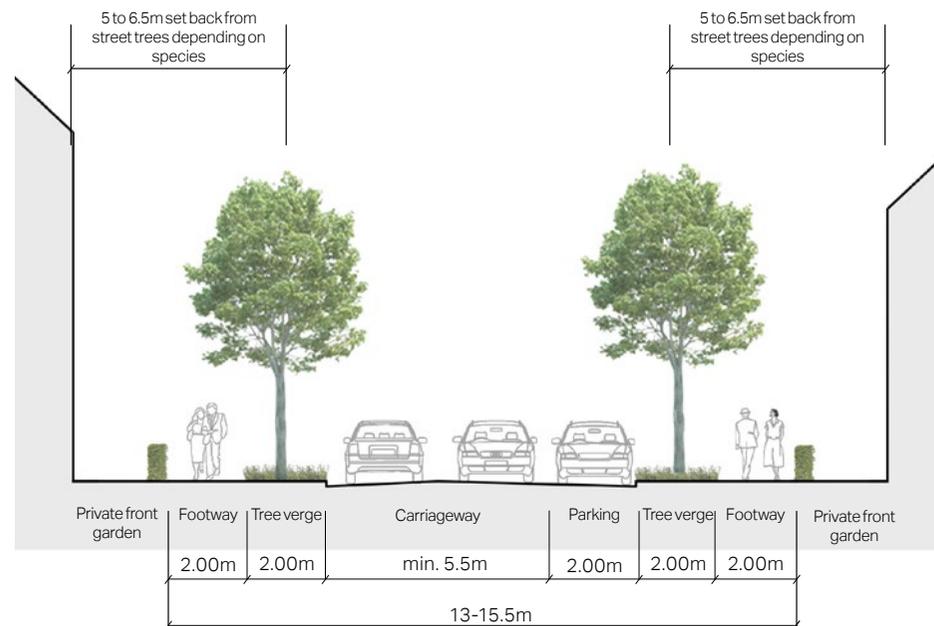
Cross-section to illustrate some dimensions for secondary streets.
